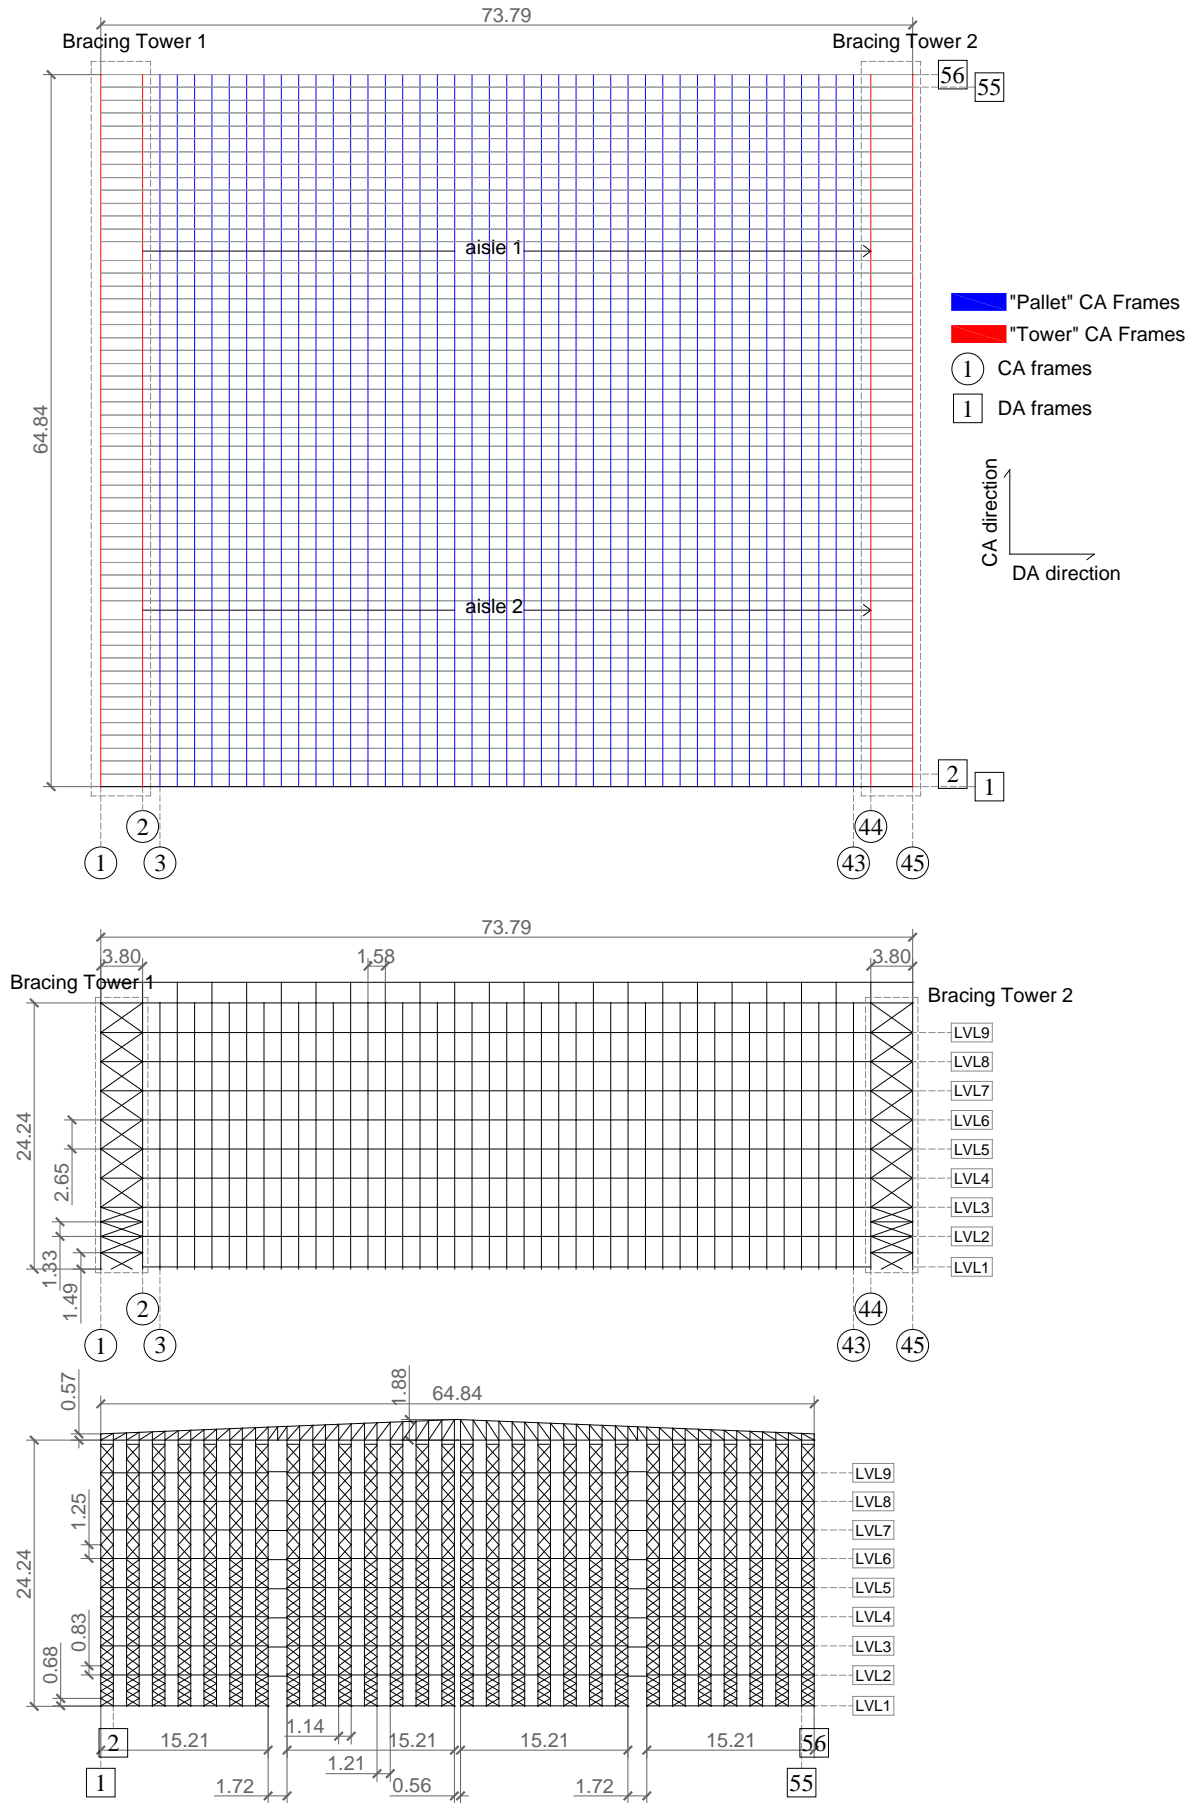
Structural configuration of CS1, showing plan, down- and cross-aisle views.
